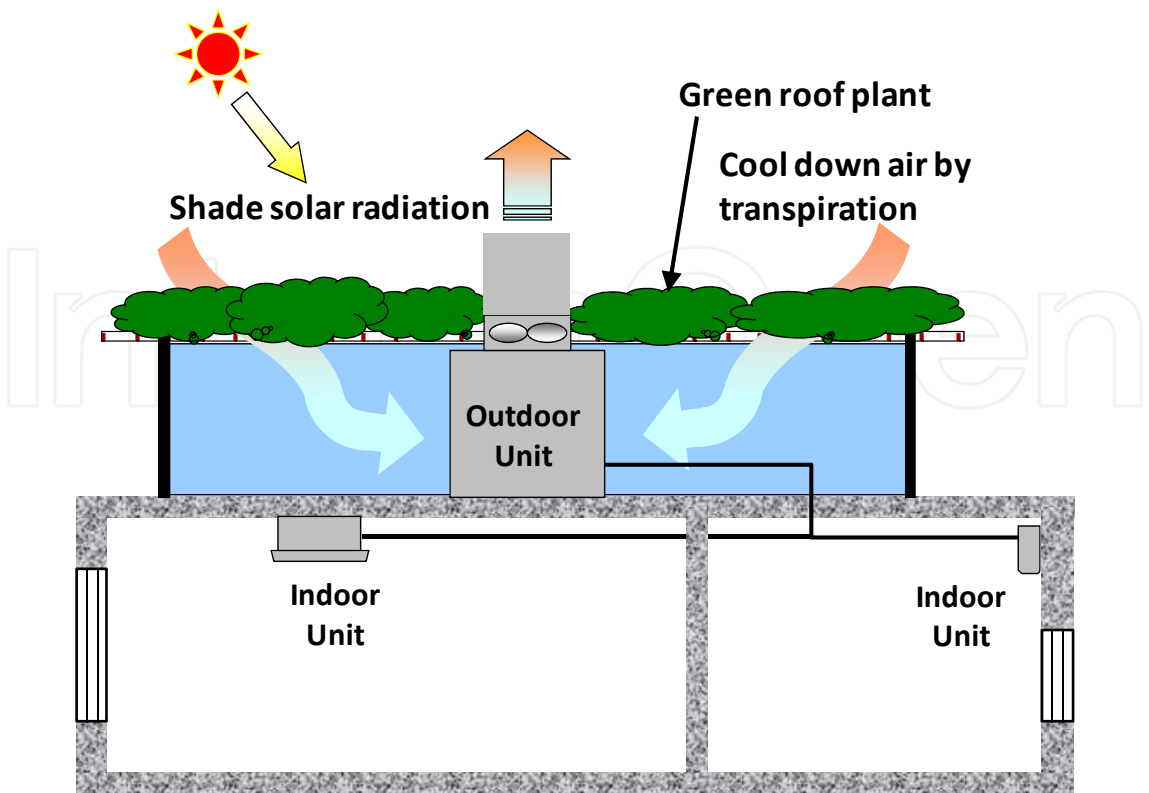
The system combining the green roof plants with air-conditioner outdoor units.
